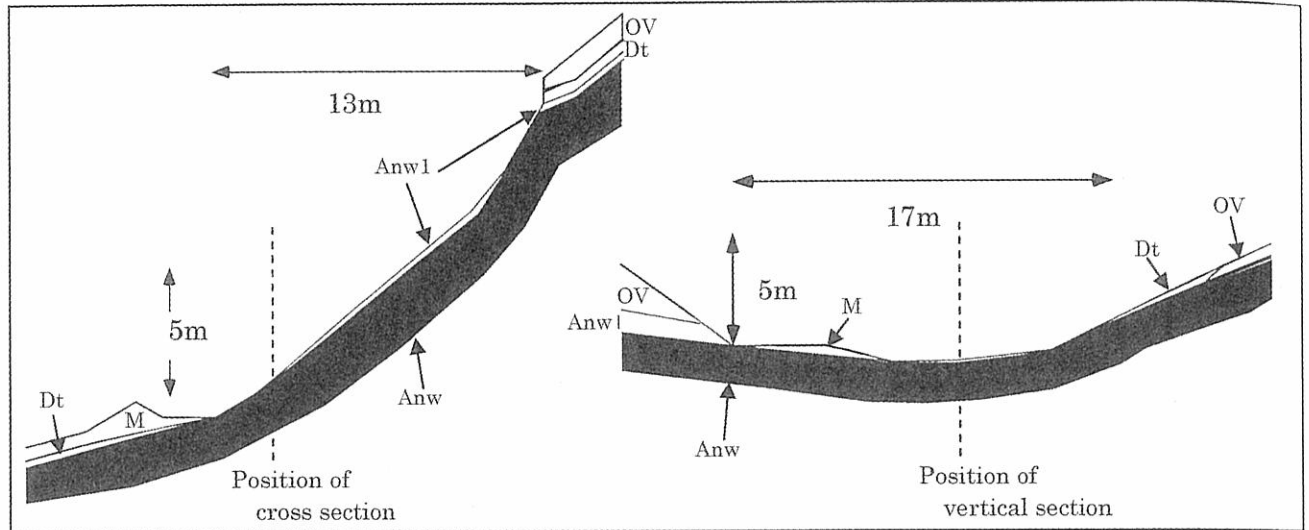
Vertical section(left) and cross section(right) of the slope failure 2
